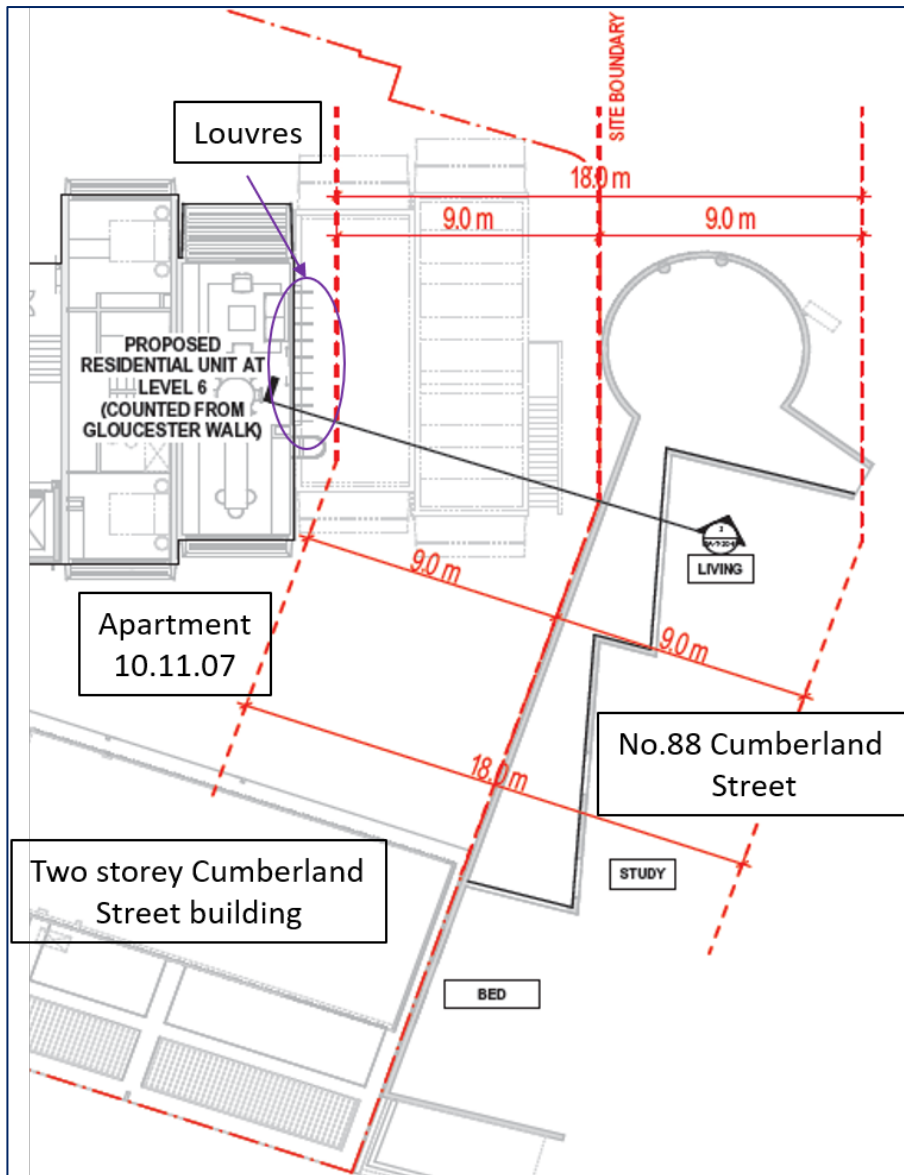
| Separation between Sirius building and residential apartment, 88 Cumberland Street (Source: RtS)
